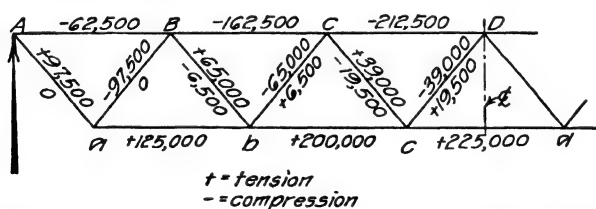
Live load stresses, deck Warren truss uniform live load.
